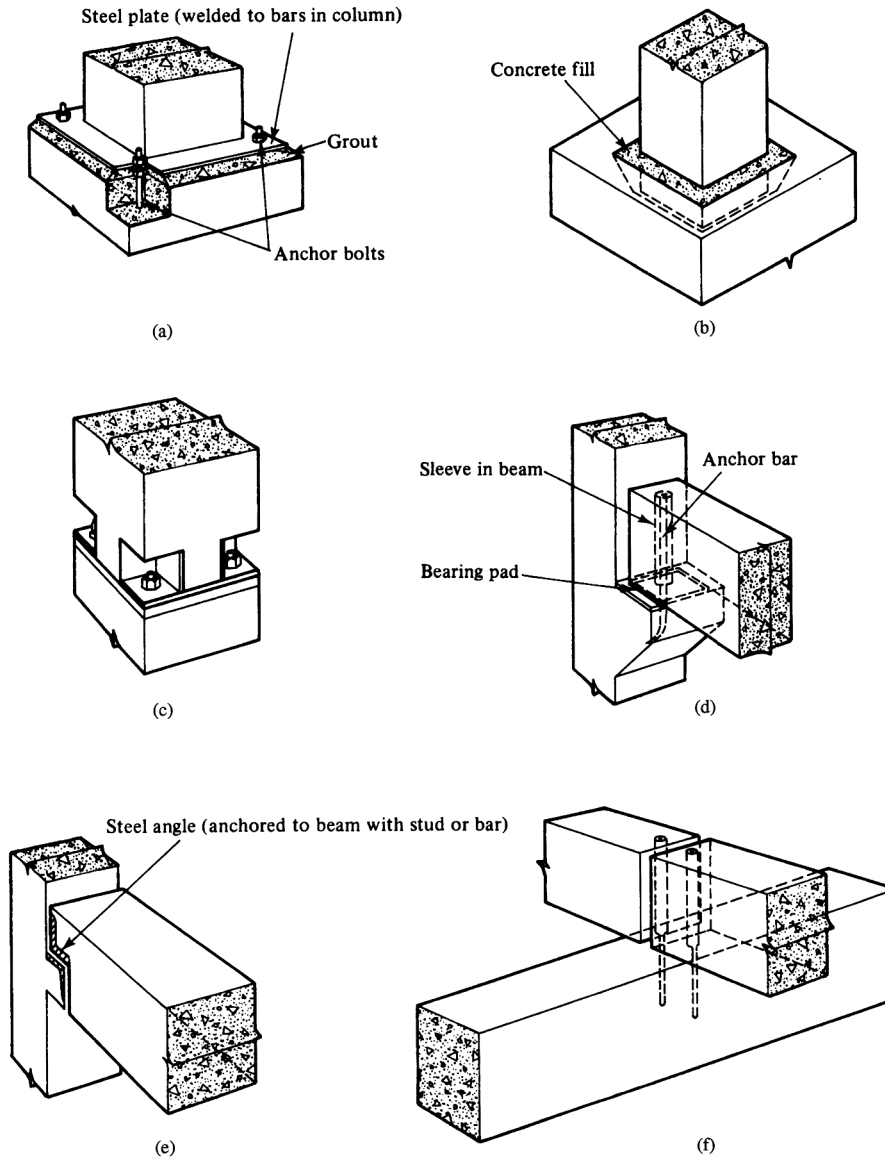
Typical connections between linear elements: (a), (b) column to footing; (c) column to column; (d), (e) beam to column; (f) beam to girder
